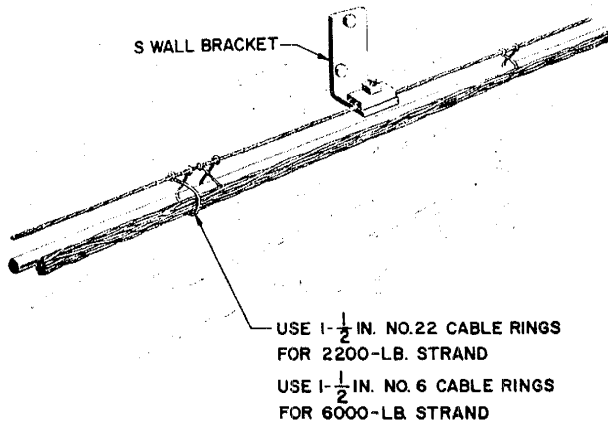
Wire Run in Cable Rings Paralleling Cable Supported with Strand
